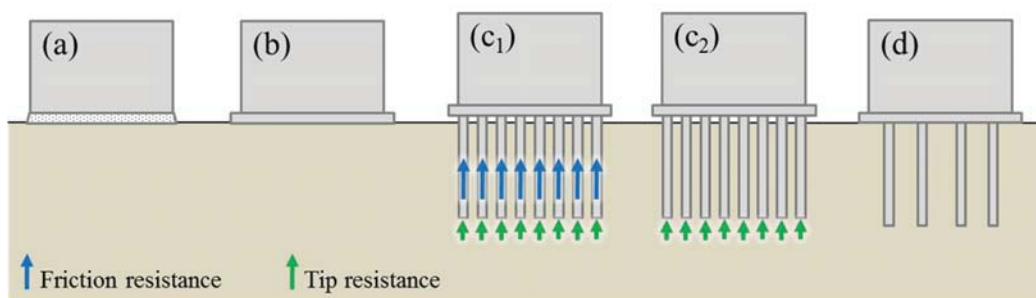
Oil tank foundation types; (a) Earth foundation, (b) Slab foundation, (c₁) Pile foundation with end bearing and frictional piles, (c₂) Pile foundation with end bearing piles (d) Piled raft foundation.
